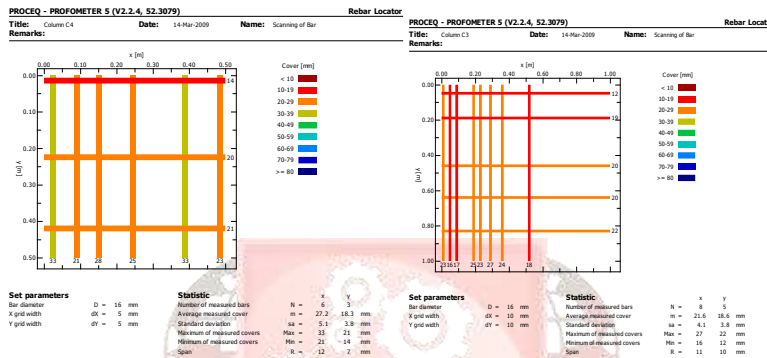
Details of reinforcement in column C4 (first floor) ESR & C3 (first floor)
